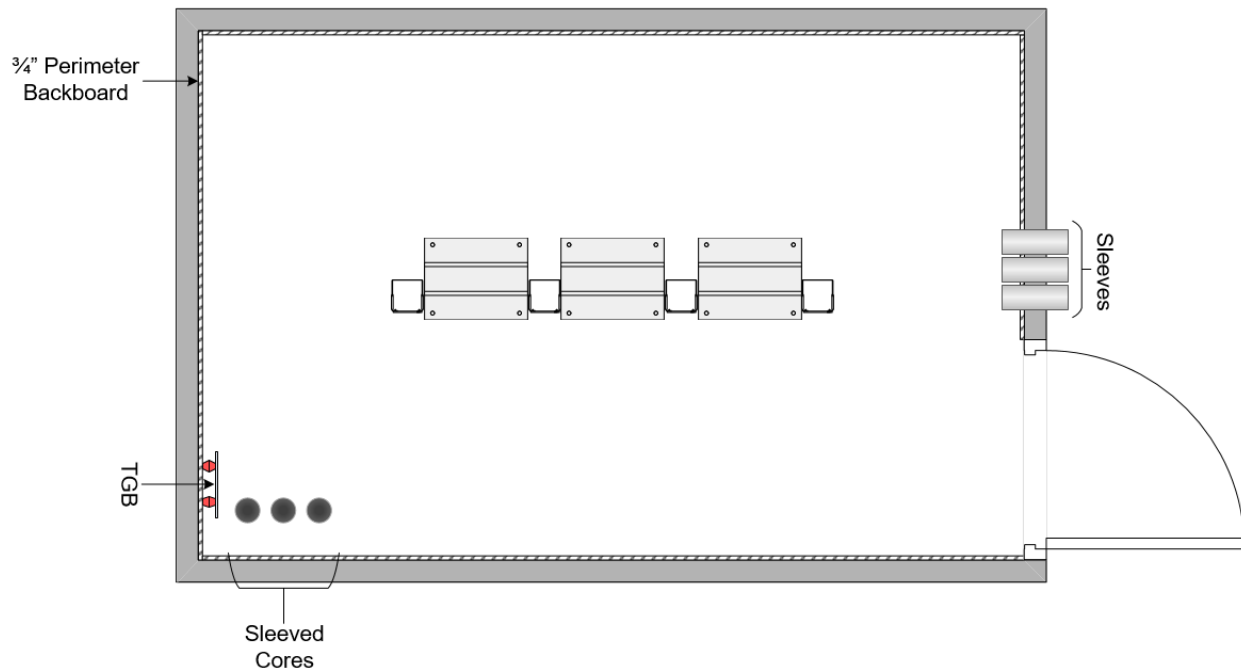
Typical example of telecommunications room floorplan showing equipment racks without overhead ladder tray.
